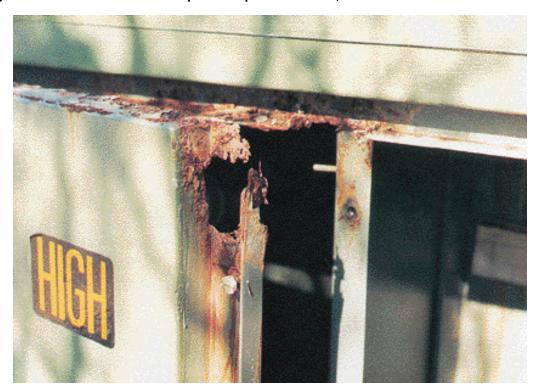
Wall Corrosion at Bottom of Compartment Door, Covered when Other Door Closed
